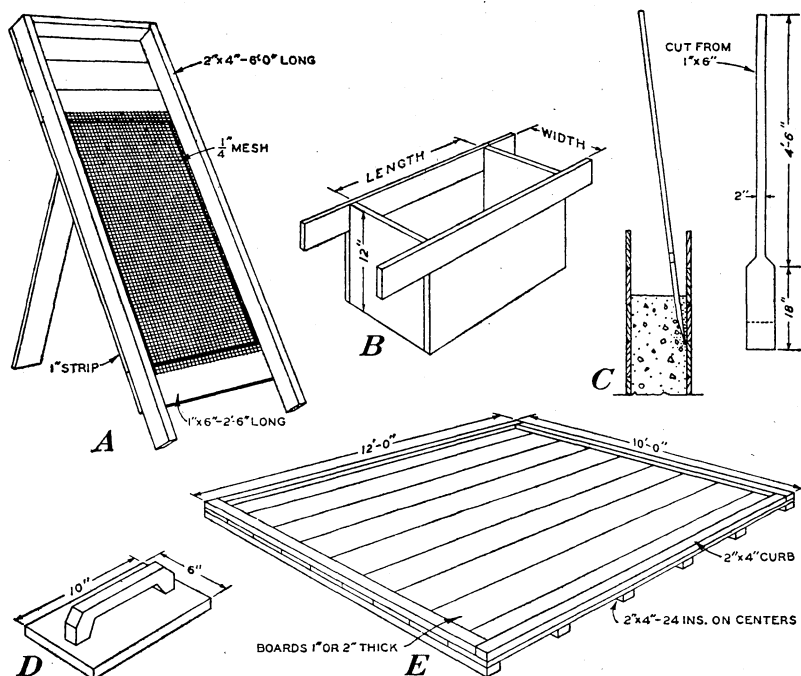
Tools used in mixing concrete: A, screen; B, bottomless measuring box; C, wooden spade for working concrete in the form; D, wooden float; E, mixing board.
